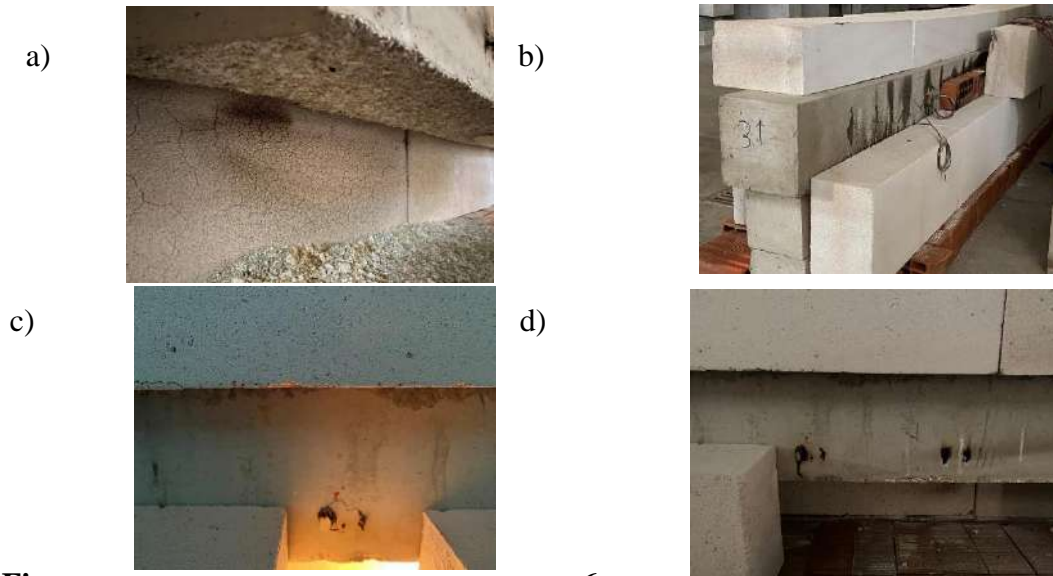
Deterioration in specimens a) Peeling- pulverisation -spalling b) Water loss c) Cracks d) Darkening
